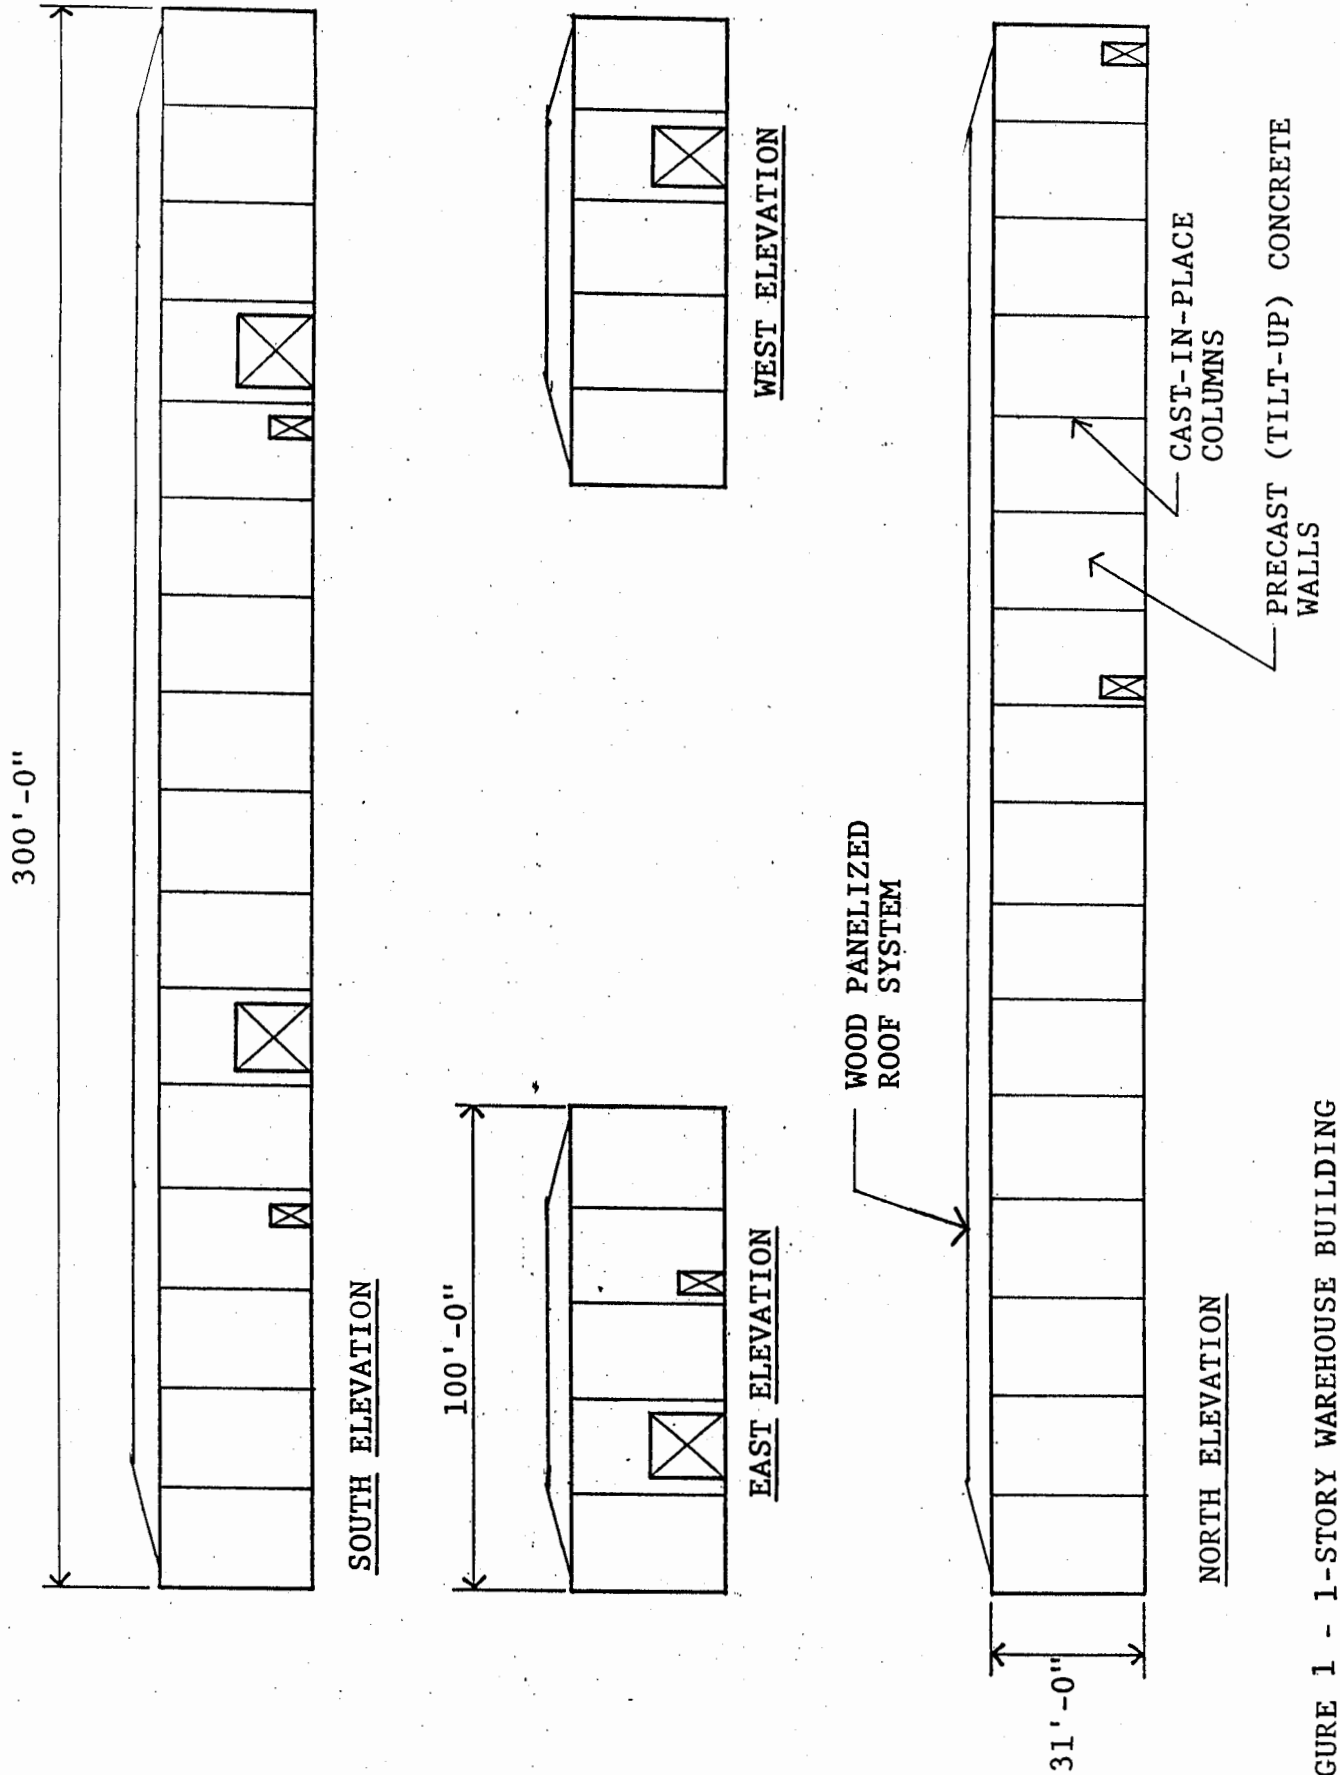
1-STORY WAREHOUSE BUILDING
